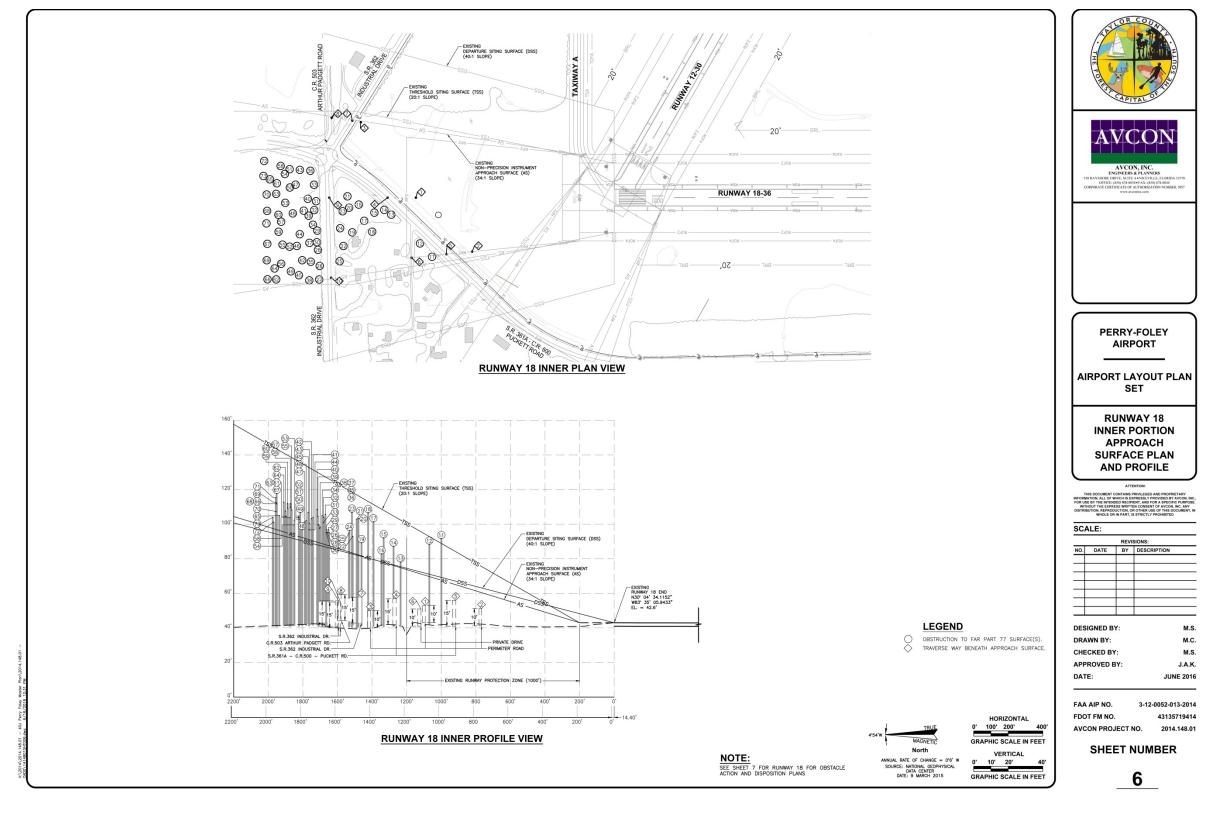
RUNWAY 18 INNER PORTION APPROACH SURFACE PLAN AND PROFILE
